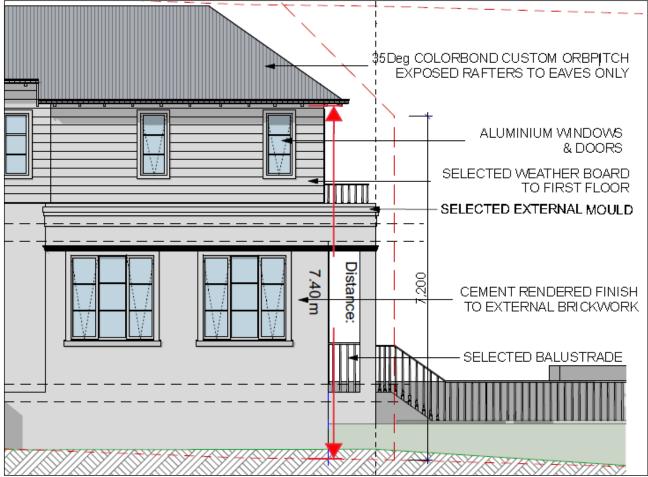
Wall Height Non-Compliance at the Northern Side Elevation
